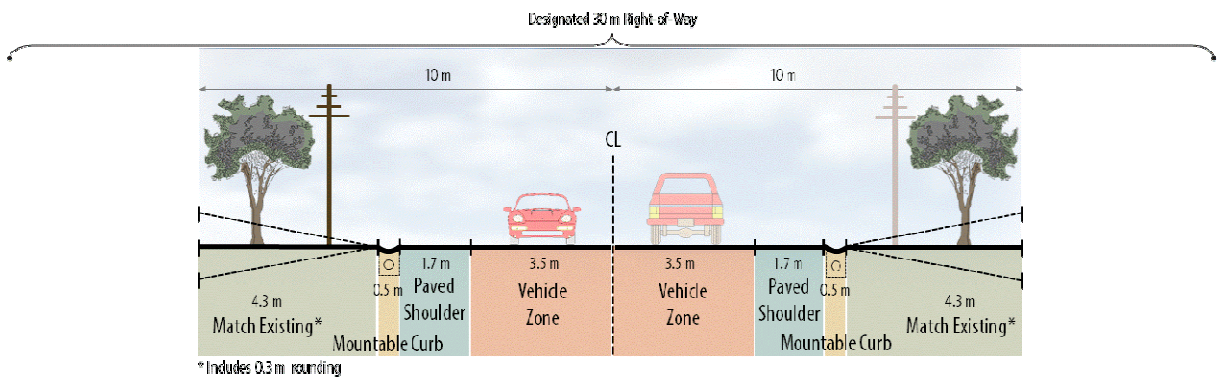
11.4 m Platform Semi-Rural Cross-Section for Mississauga Rd. / Old Main St.
